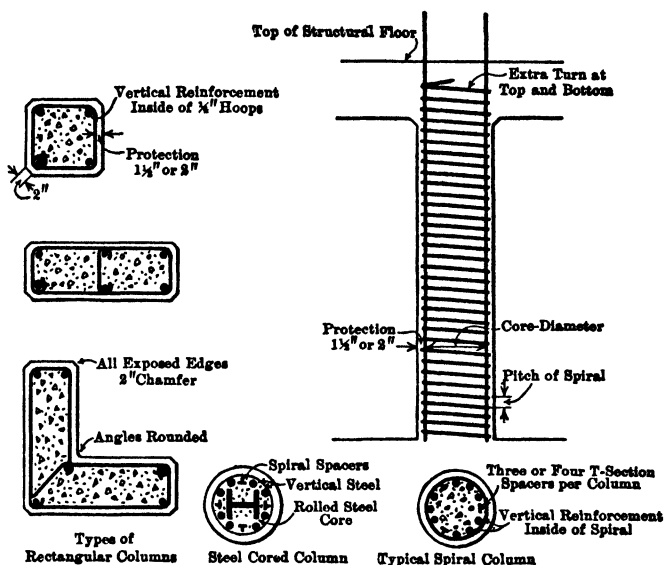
Types of Reinforced-Concrete Columns and Arrangement of Reinforcement
